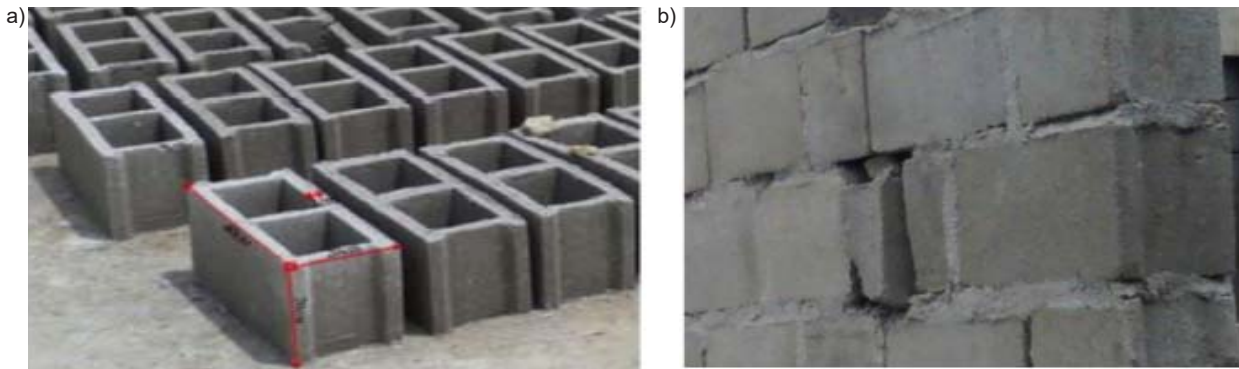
Illustrations of the components of the hollow sandcrete masonry units for the Sandcrete Building: (a) individual hollow sandcrete block unit; (b) typical constructed walls joined with cement-sand mortar (images adopted from: Abanda et al., 2015)
